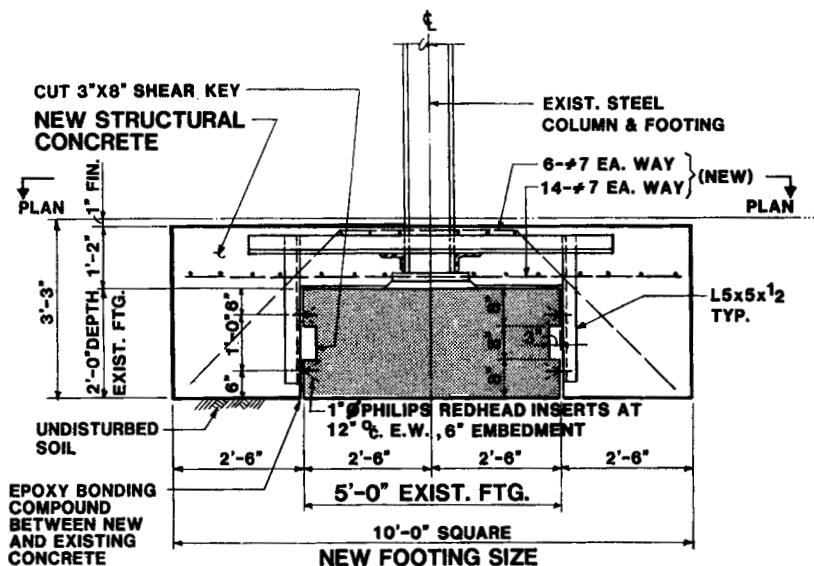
Cross-sectional view of Figure 8.13.
